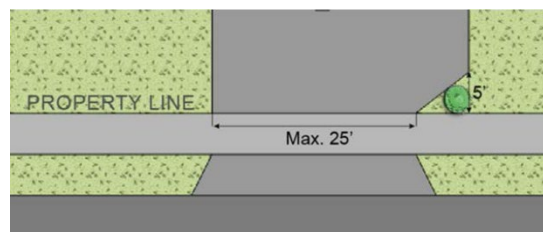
C: Single & Two-Family Drive Width—Taper Detail
